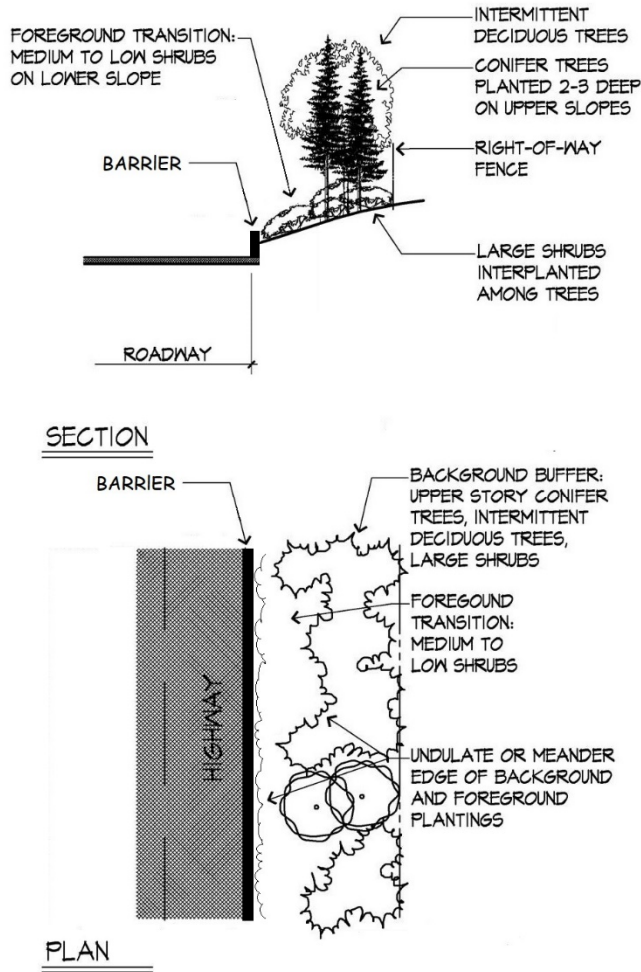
Roadside Planting on Cut Slopes with Barrier or Guardrail.
